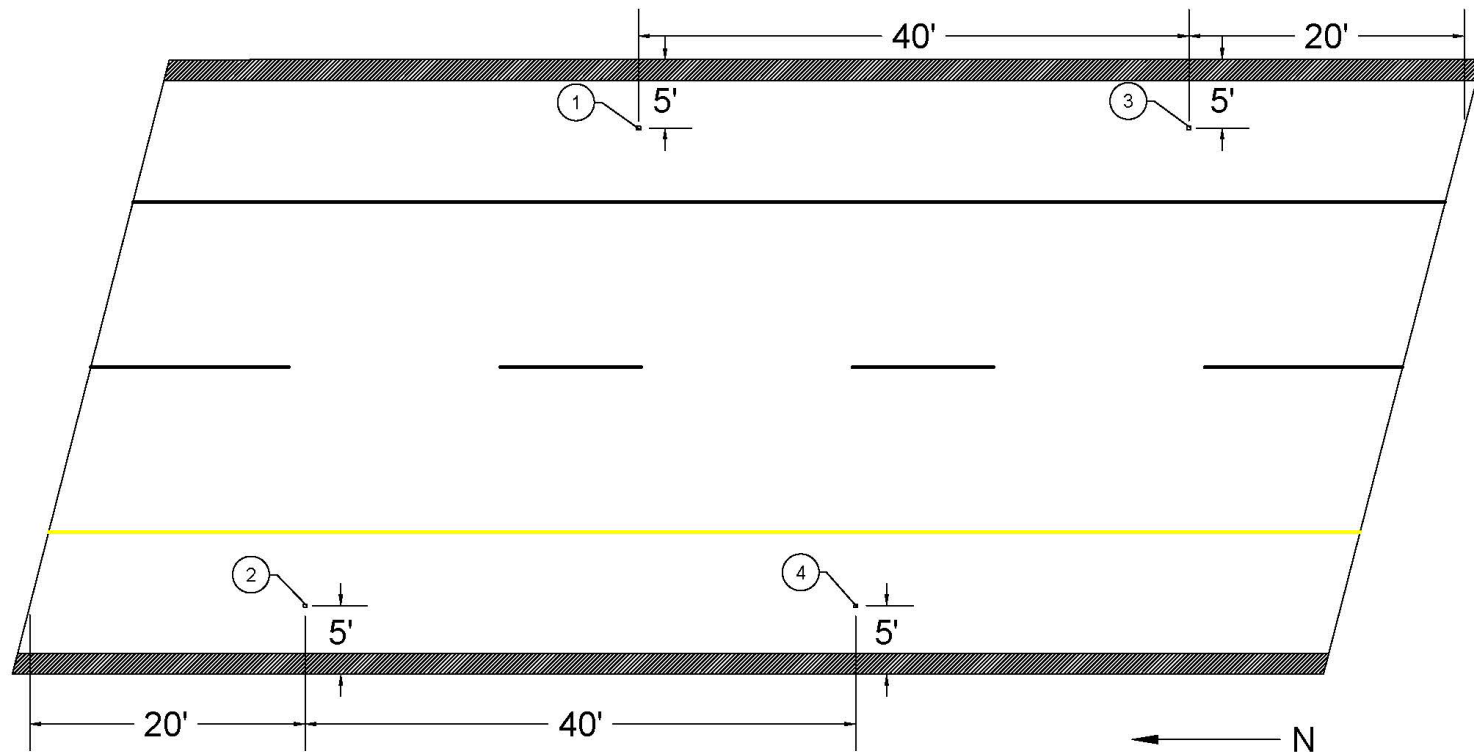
Sampling locations for concrete collected for cylindrical and beam specimens for Wolverine Way NB deck.
